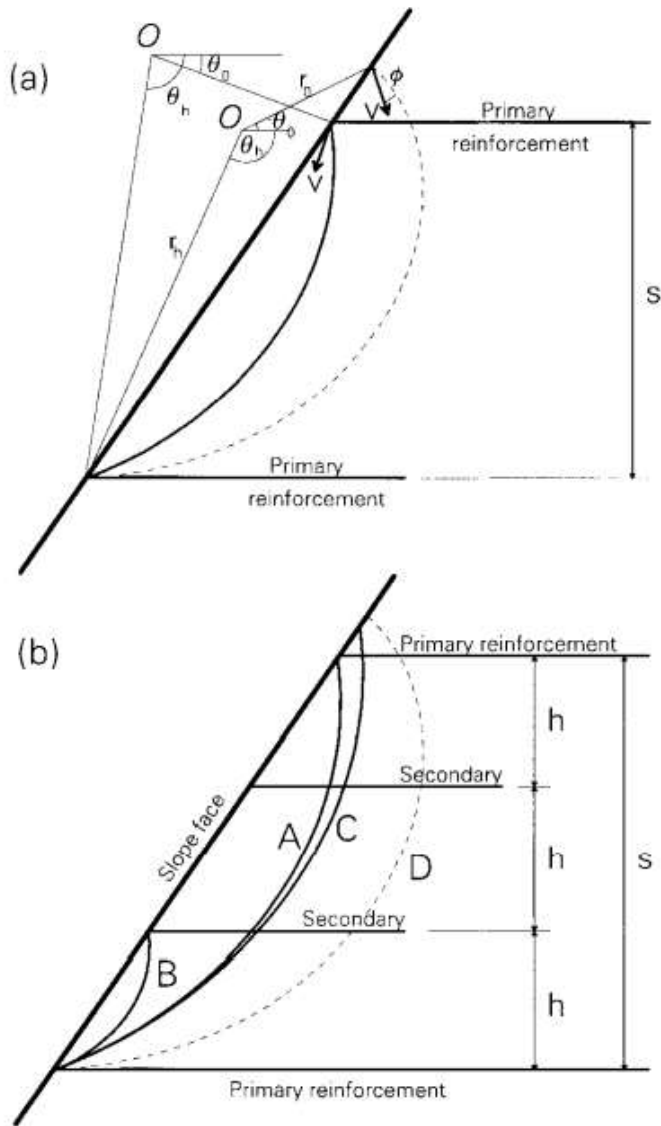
Shallow failure mode between layers of primary reinforcement (a) without secondary reinforcement; (b) with secondary reinforcement (Michalowski 2000)
